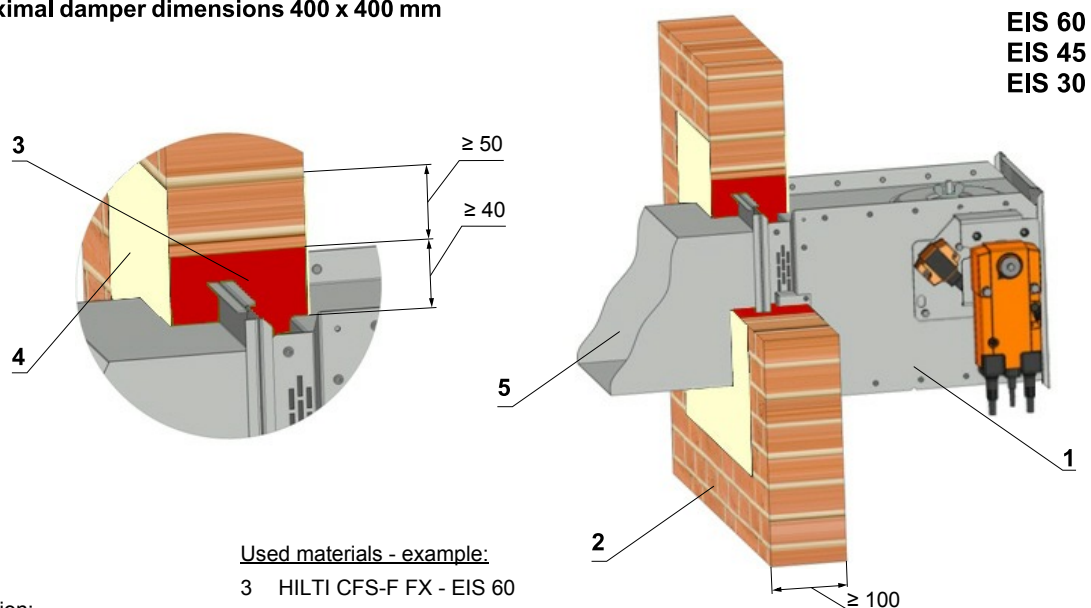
Solid wall construction - fire protection foam with stucco plaster
